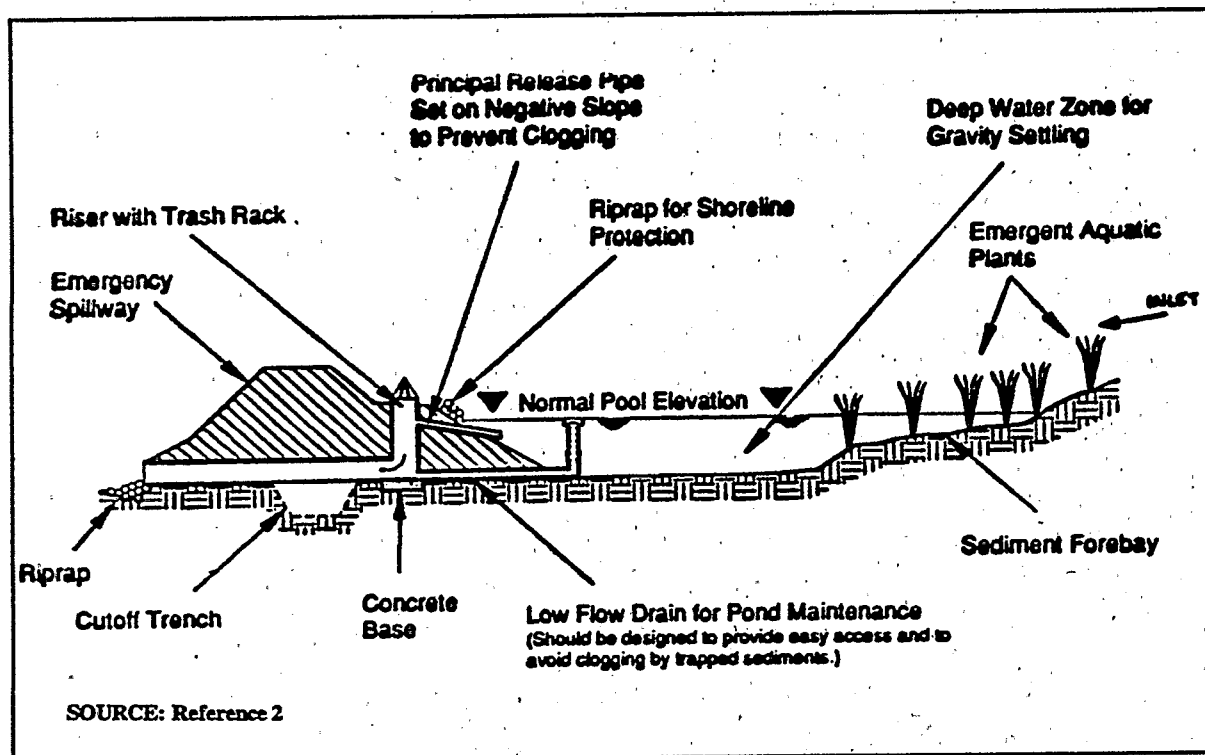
TYPICAL LAYOUT OF A WET DETENTION POND
